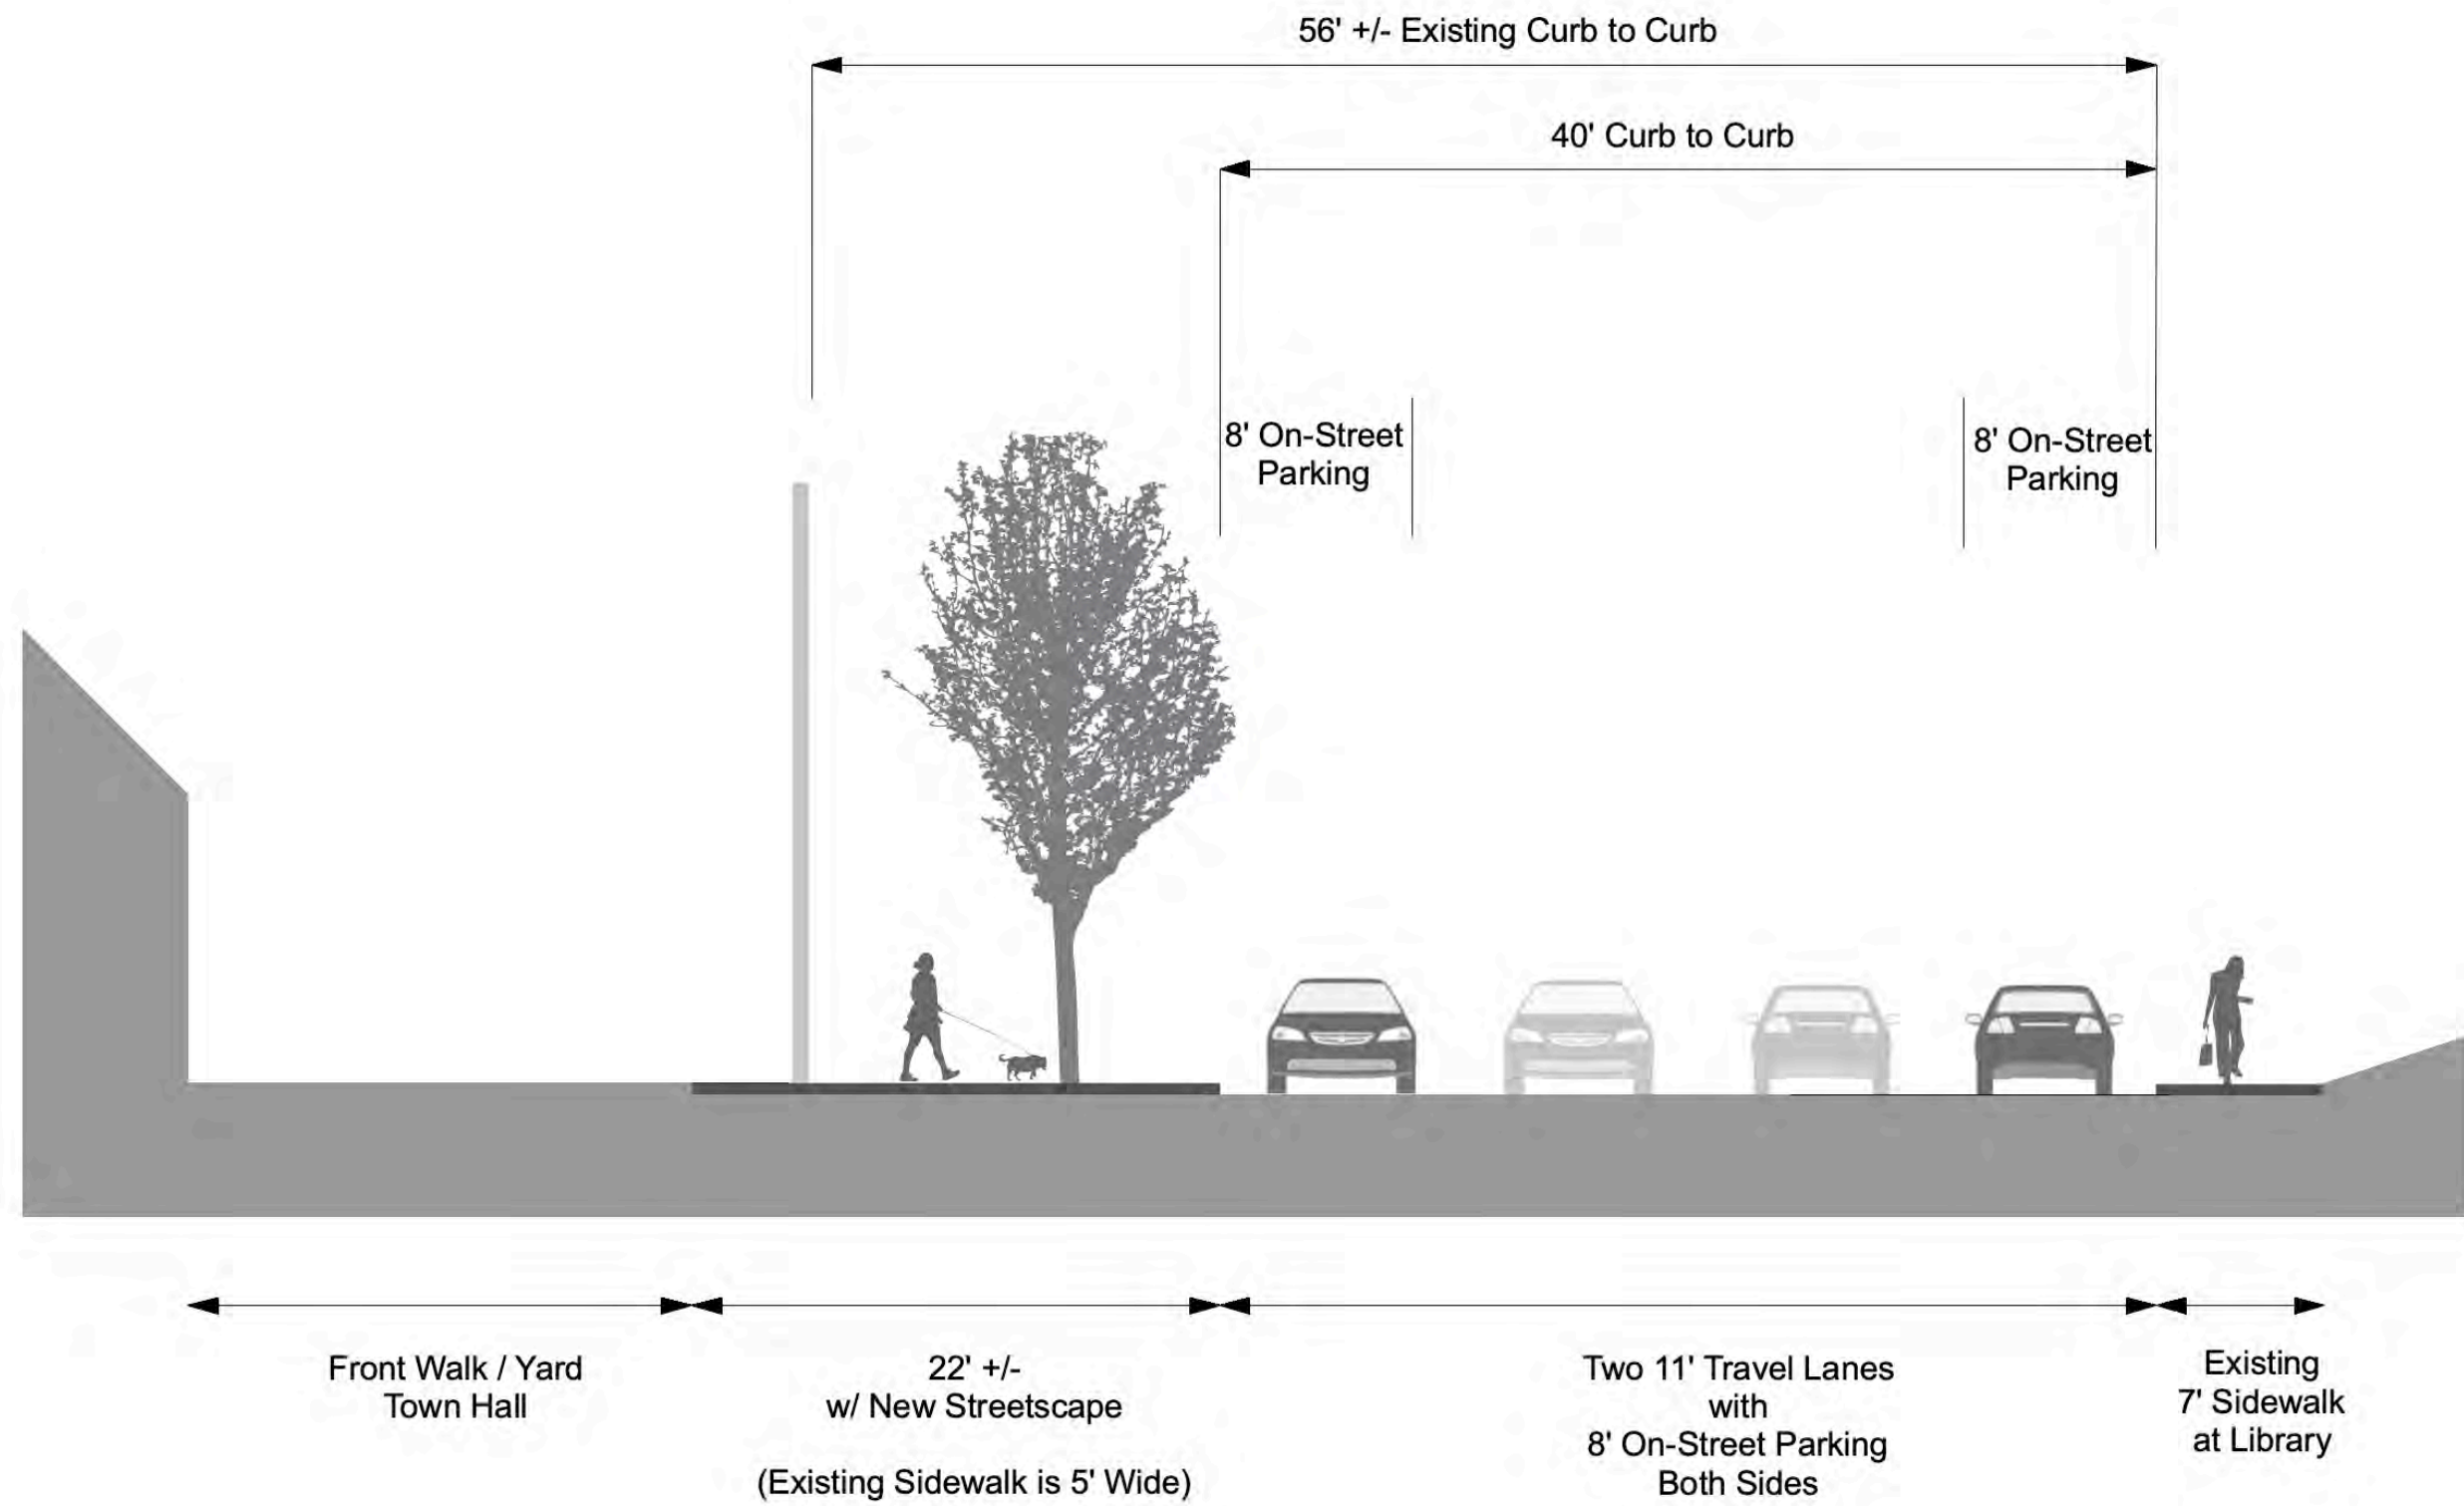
Main Street Roadway Section at Town Hall/Library
